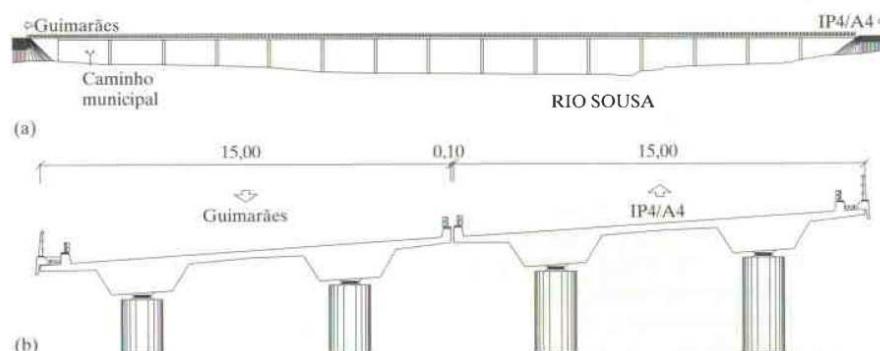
(a) Elevation (b) and cross section of Rio Sousa Bridge¹³ (Units: m)
